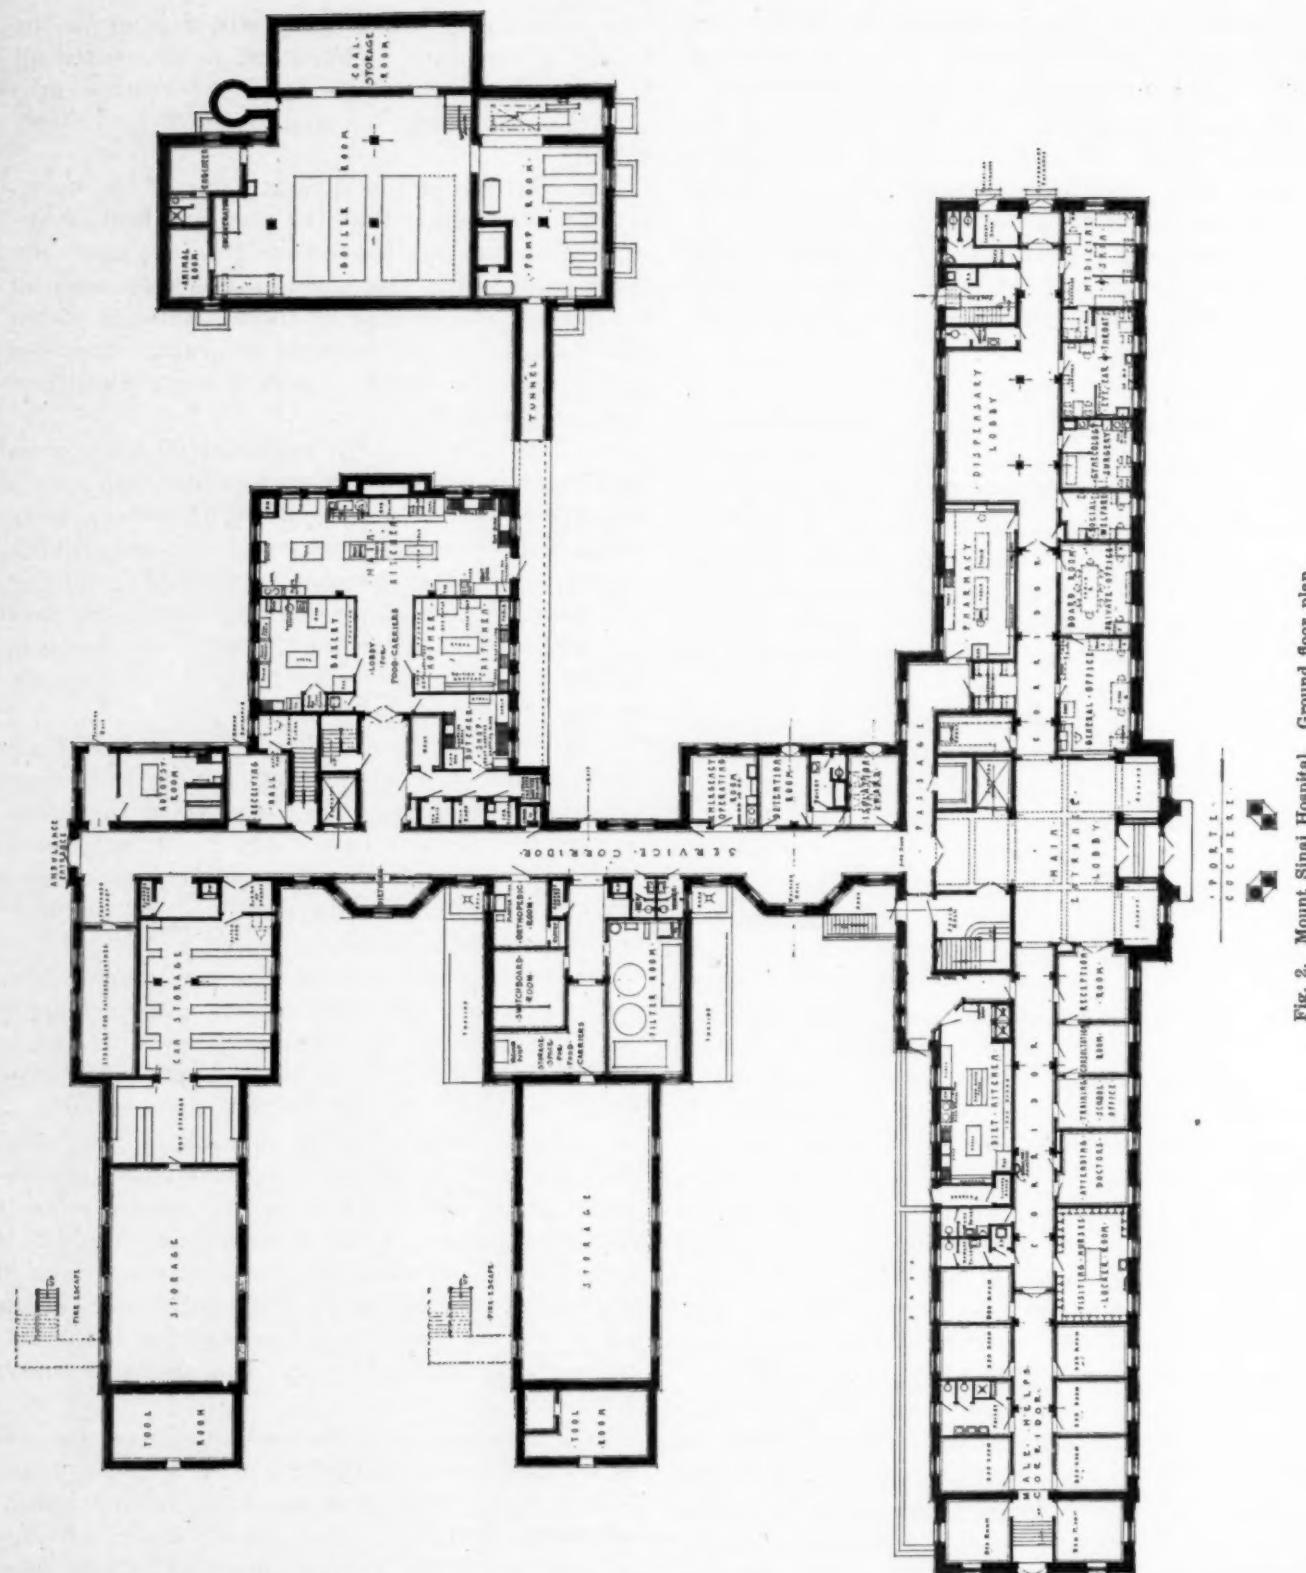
Mount Sinai Hospital. Ground floor plan.
